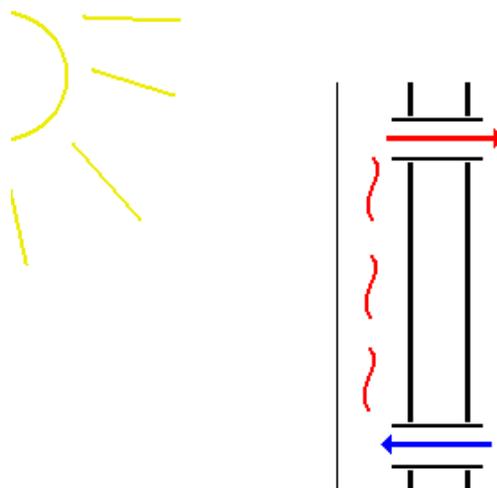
Trombe wall (figure by Erik Gustavsson).
